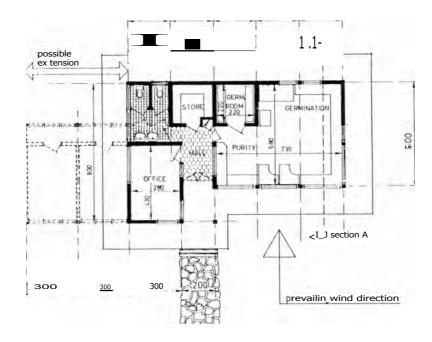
Suggested floor plan for a small testing laboratory (adapted from van der Burg and others 1983). Dimensions are in centimeters [no equivalent figure in Student Outline].
